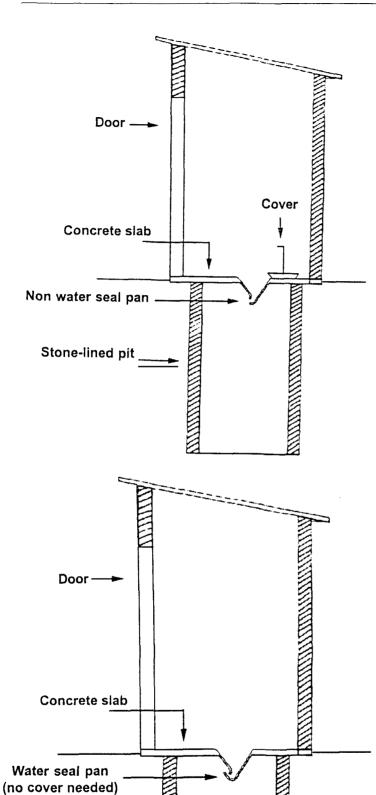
Cross-section of single pit latrine with circular concrete slab and non-water seal pan with cover.
